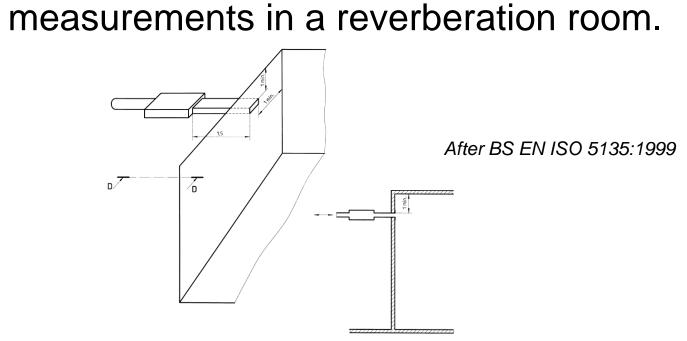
Mounting detail for air-terminal units installed outside room boundary
